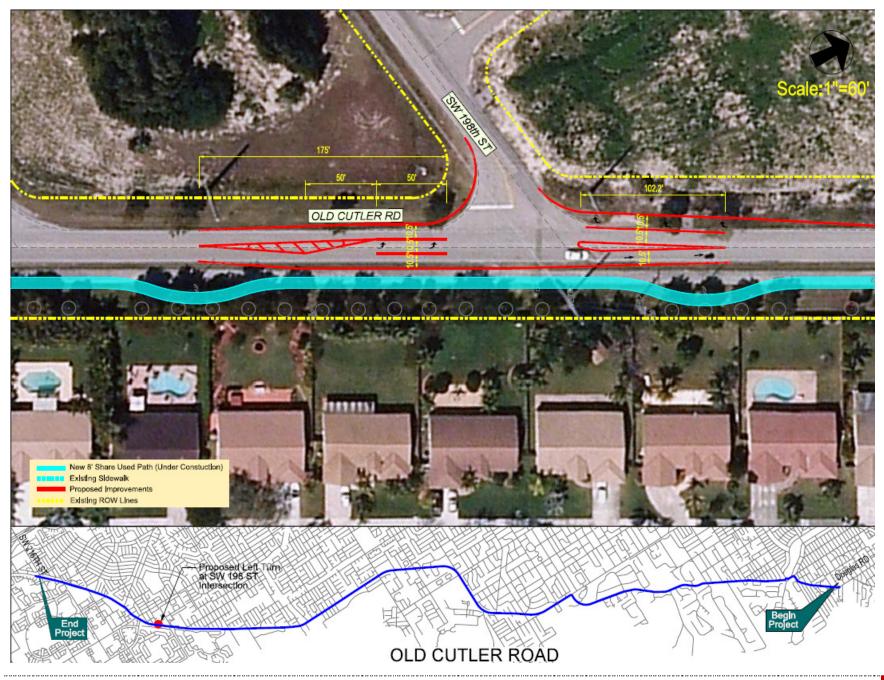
OLD CUTLER ROAD - POTENTIAL IMPROVEMENTS AT SW 198 STREET
